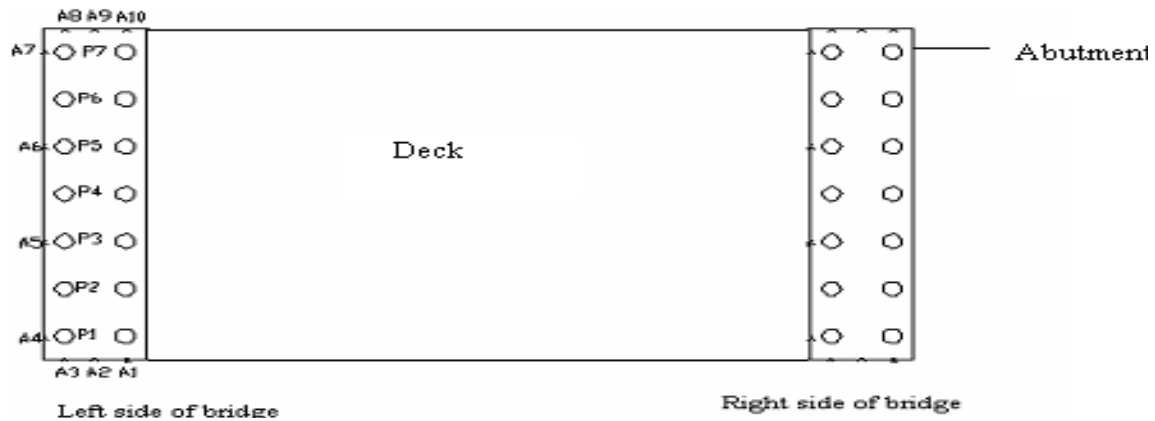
Plan view of scour measurement label at abutments and piles for double row pile integral bridge.
